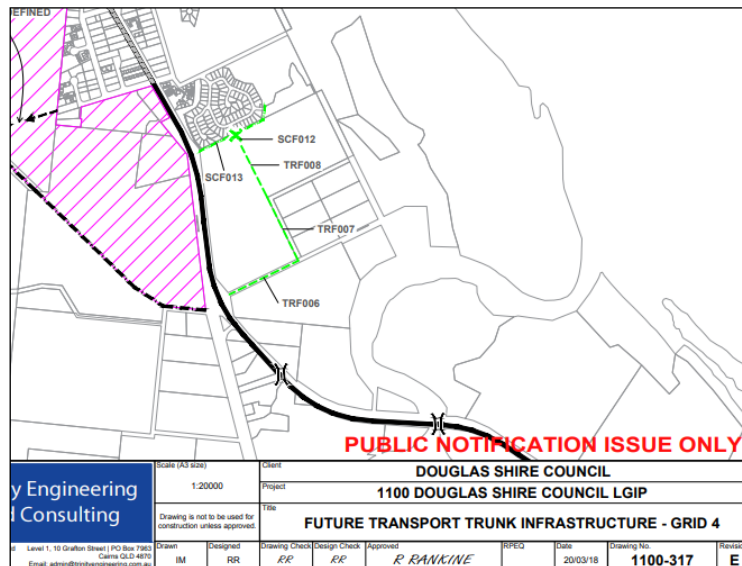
LGIP Future Transport Trunk Infrastructure Plan
